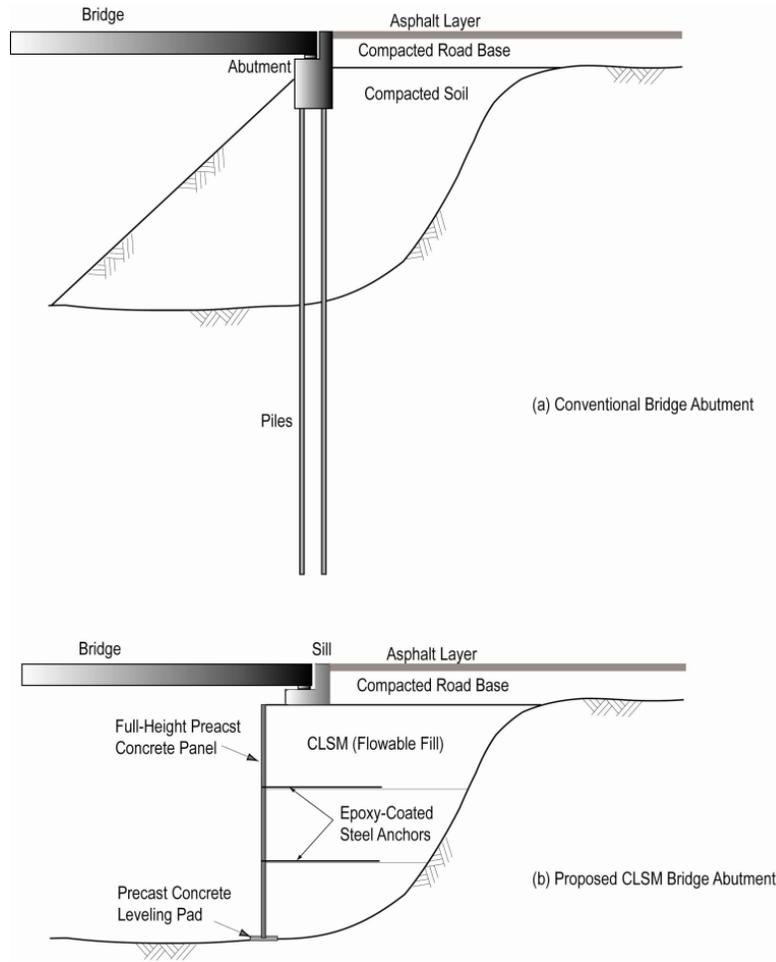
Comparison Between (a) Conventional Bridge Abutment and (b) CLSM Bridge Abutment
